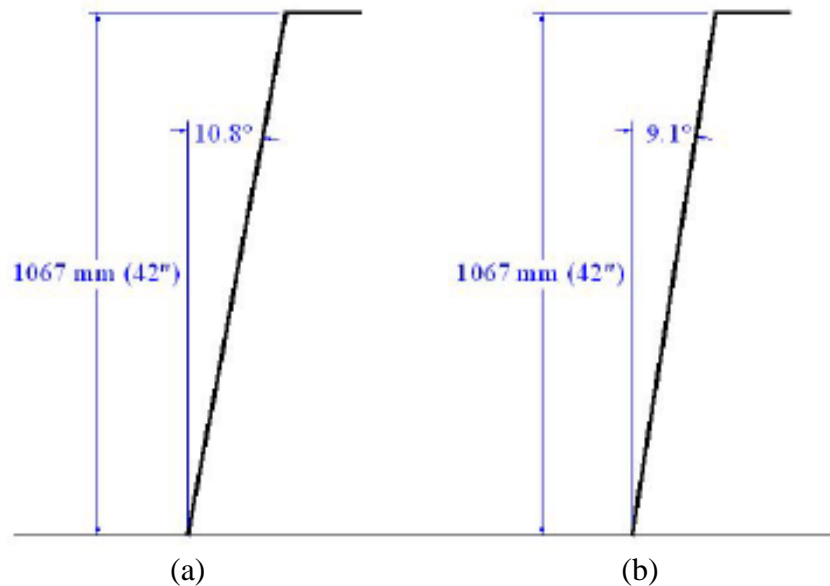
Single Slope PCBs: (a) Texas SSCB and (b) California Type 60 [22]
